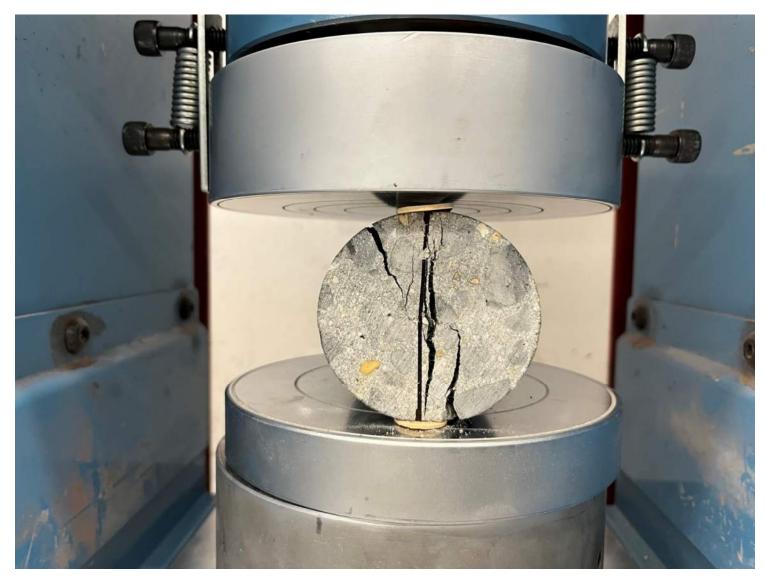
Split tension testing of specimen 4B-1 after peak load
